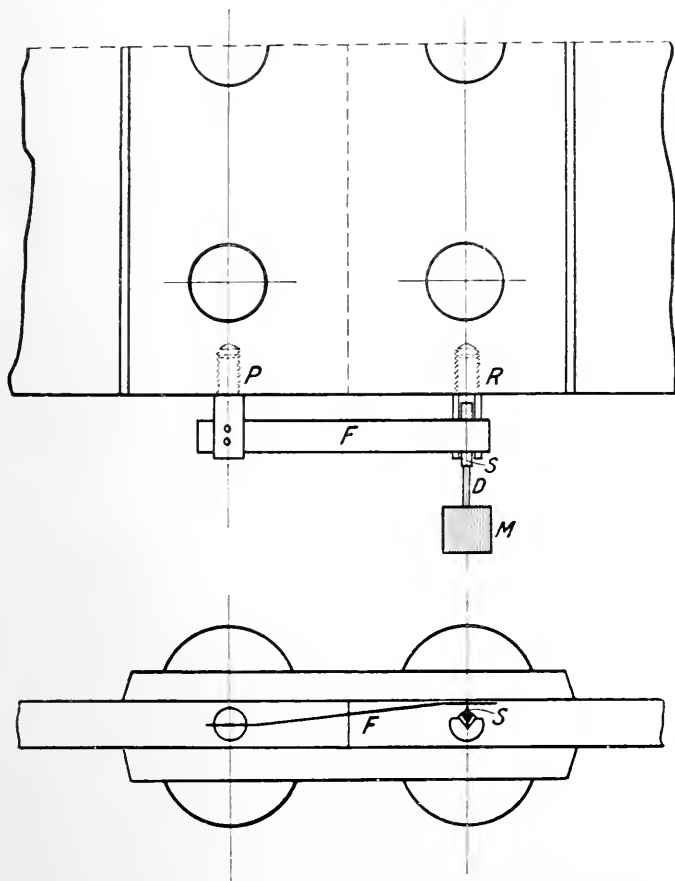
No. 4 Apparatus for Measuring the Slip of Riveted Joints.
